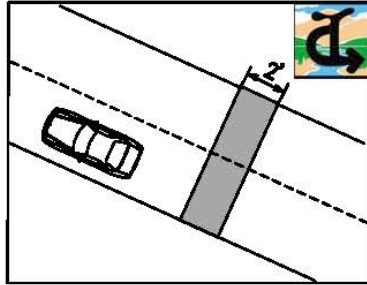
Example 8: Surface tolerances for street repairs should meet the standard for new construction.
